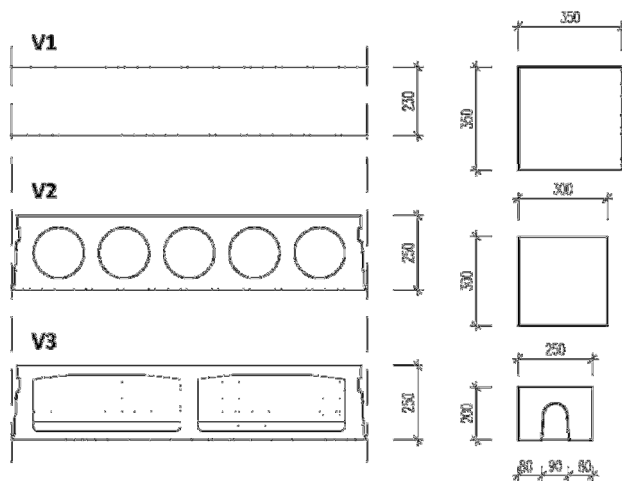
Floor structures and columns alternatives – cross section (V1 – monolithic RC frame with full RC slab, V2 – precast RC frame with hollow core RC slab, V3 – subtle precast HPC frame with panels lightened by lightening elements from wood shavings concrete)
